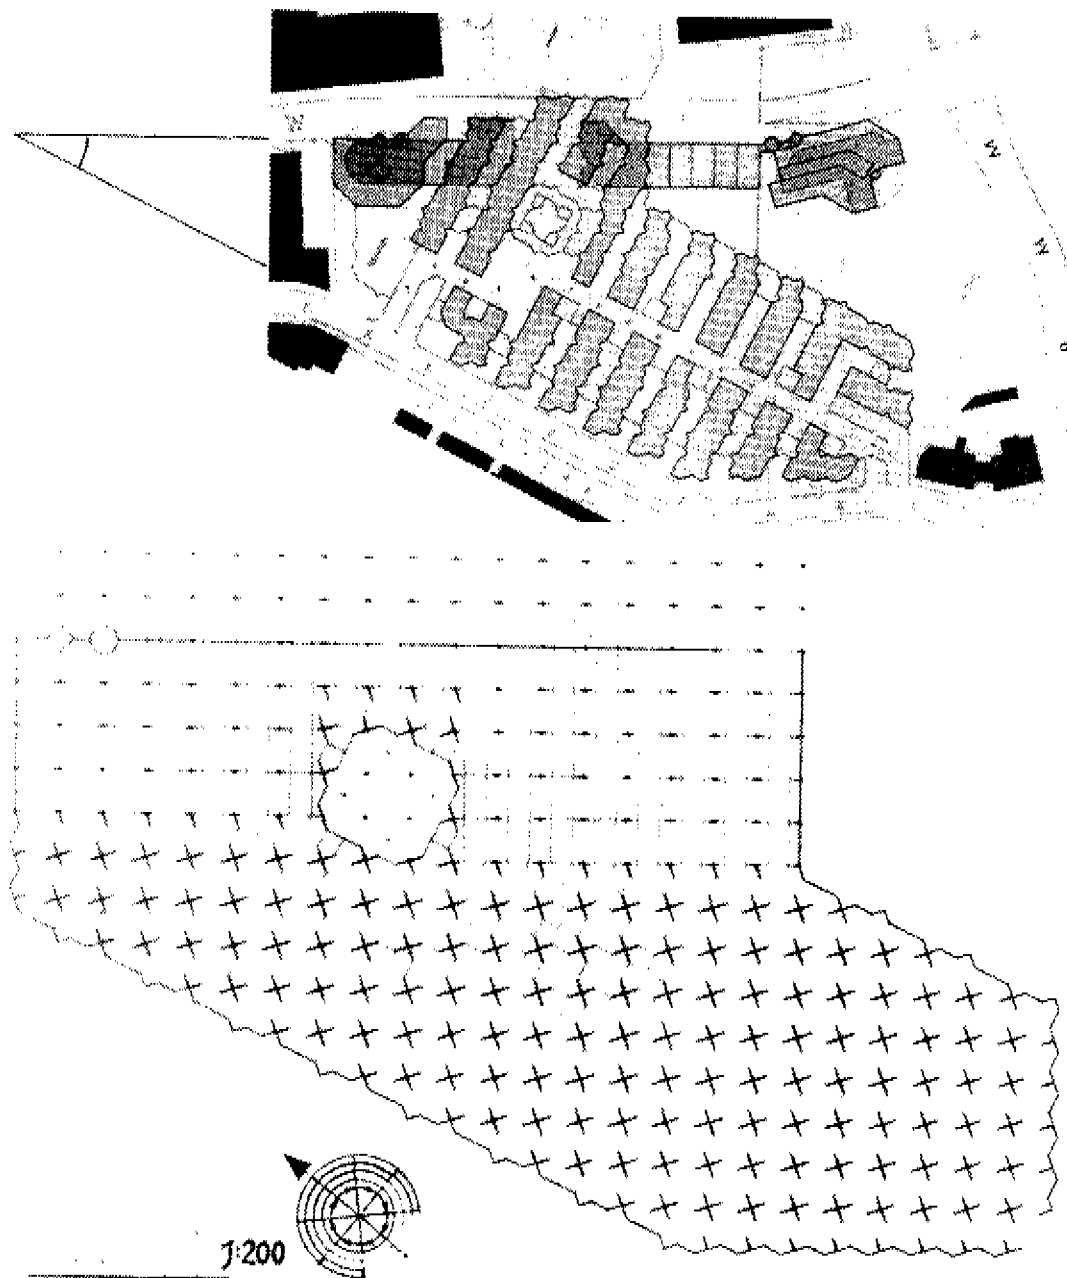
The author's studies in architectural design at the Eindhoven University of Technology (1979). The drawings show (top) building structures on top of (below) the ground level floor construction of an underground parking near the city hall. The project's aim was achieving an ambiguous architecture which shows an intrinsic dominant harmony of constructive regularity and functional destination. The architecture may be characterized by the differences (programmatic:) public functions - housing, (constructive:) columns - walls, (technological:) concrete - brick, (Gestalt:) square and wall - 'mountain', (town-planning:) social-cultural functions - housing.
